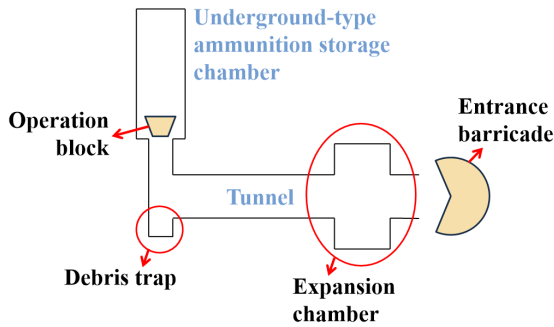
Schematic of protective structures in underground-type ammunition storage facility
